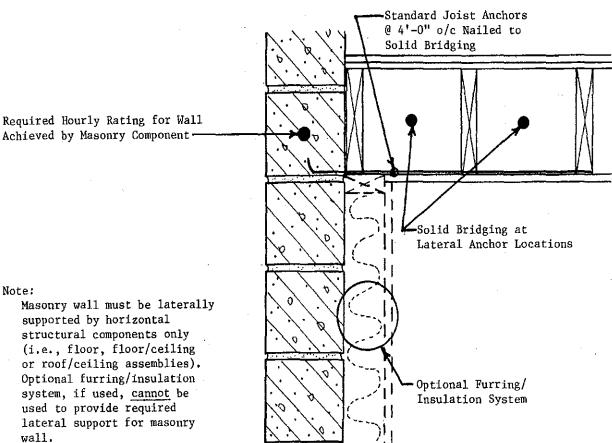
Single Wythe Masonry Wall (Bearing Condition)
